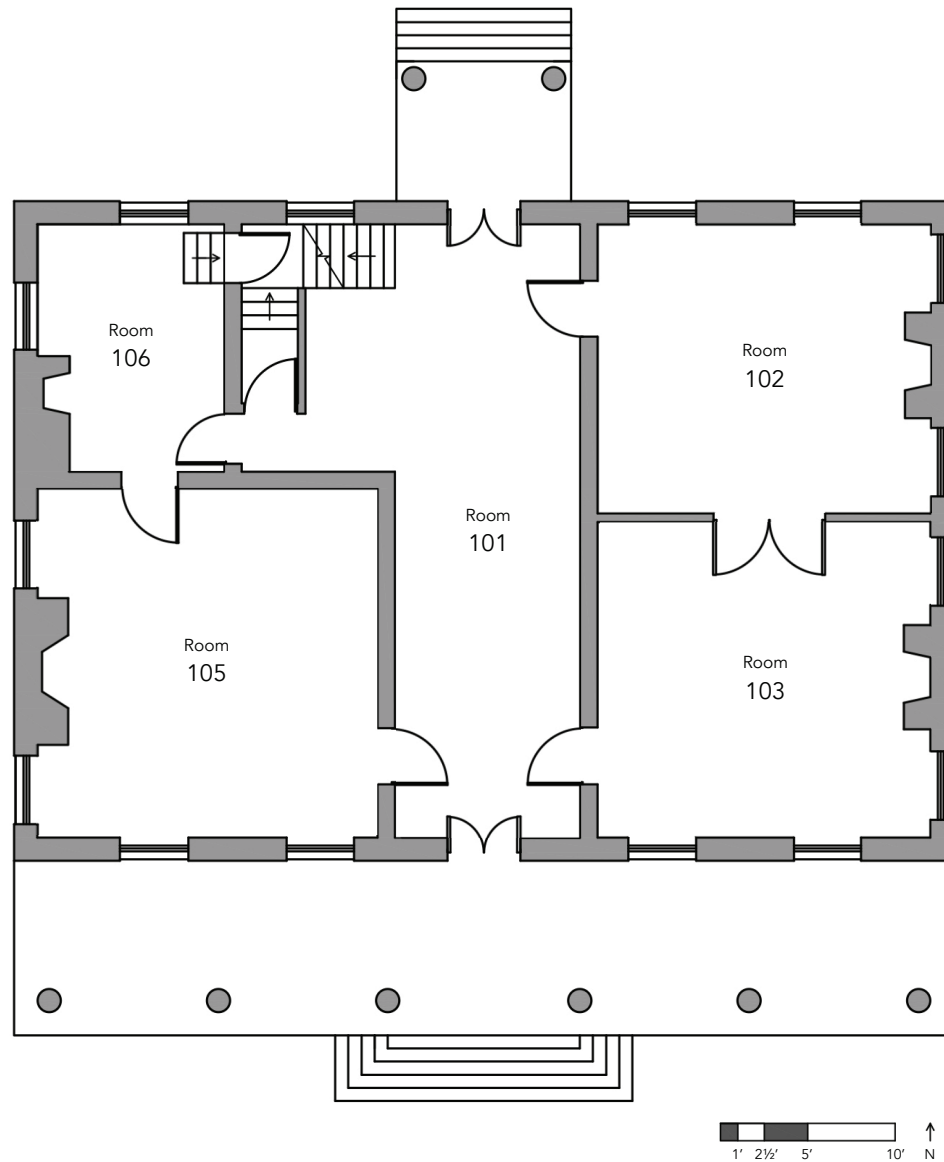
First Floor Plan of the McConnell-Busti Country House. Drawn by author, 2016.
